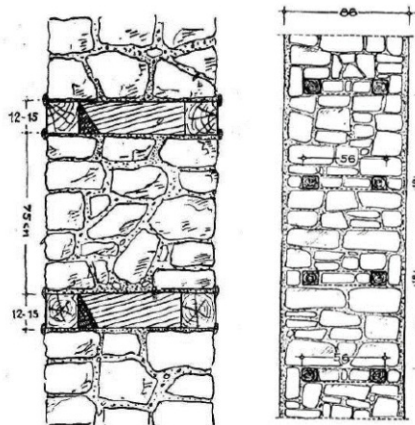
Stone masonry with visible wooden girdles (left) and invisible wooden girdles (right) (Georgiev, 2015)
